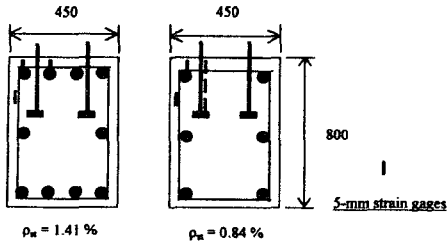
Cross-Sections of Reinf. Concrete Columns
